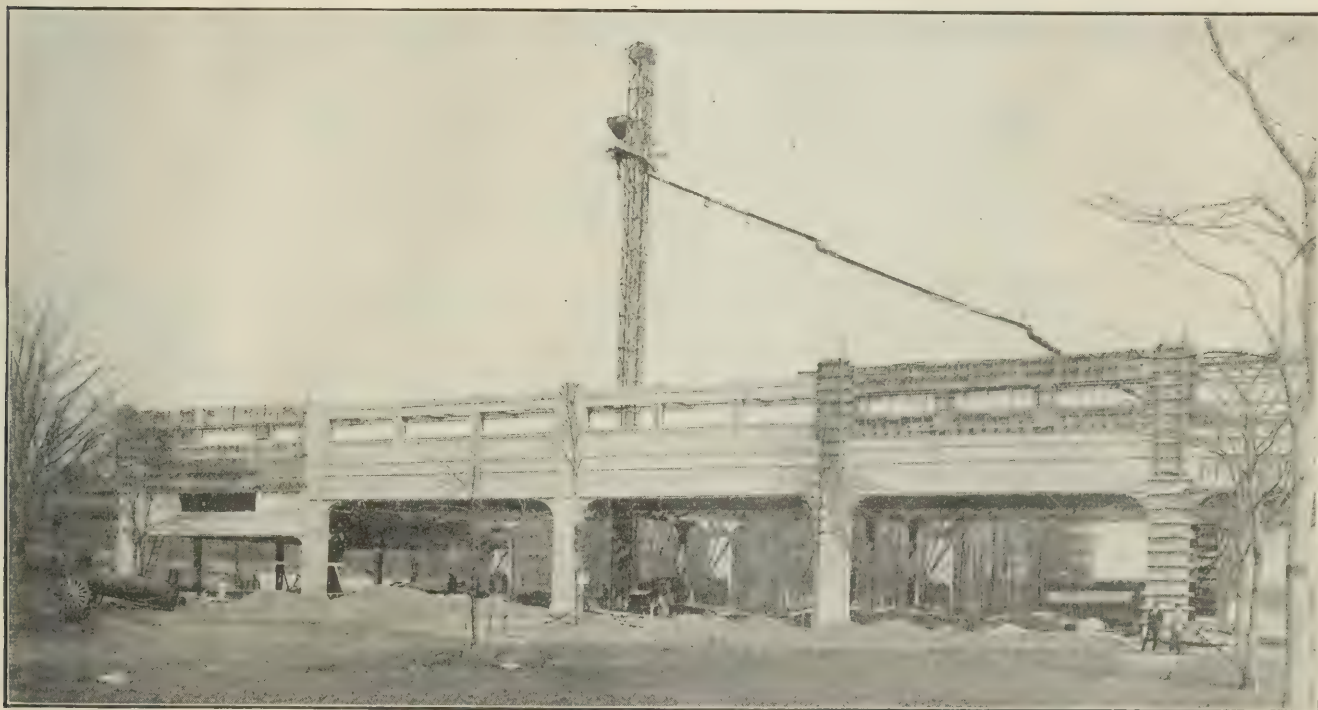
METHOD OF PLACING CONCRETE IN ELEVATED STATION
